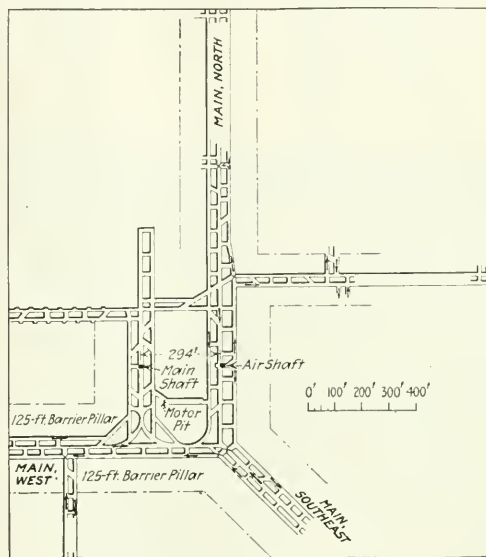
PLAN OF SHAFT BOTTOM AT AMERICAN NO. 3 MINE
